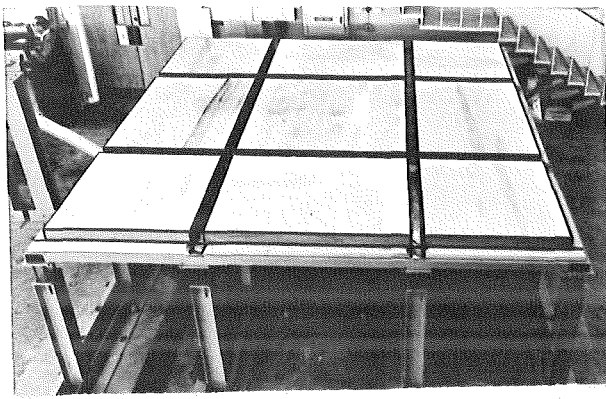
FORMWORK AND VIBRATION EQUIPMENT
